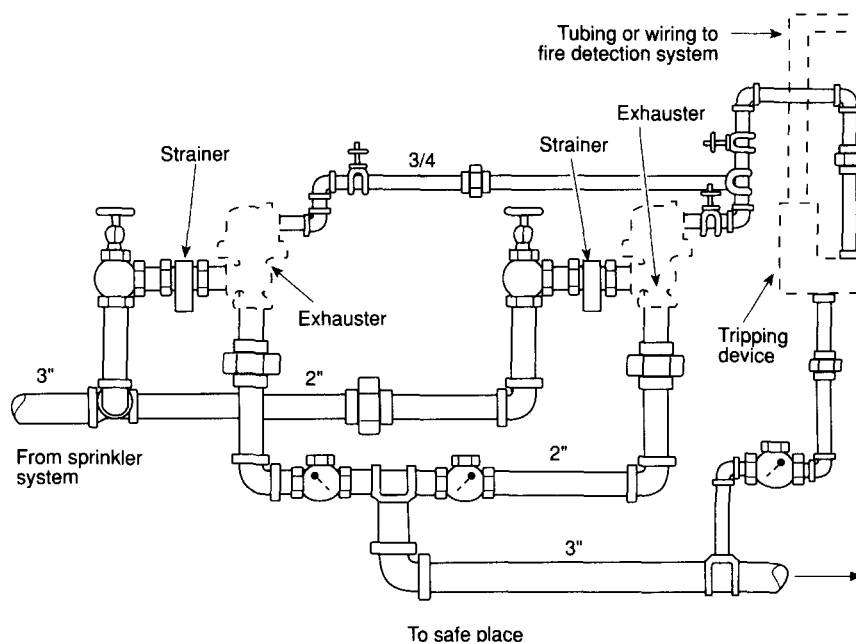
Arrangement of air exhaust valves for combined dry pipe and preaction sprinkler system.
